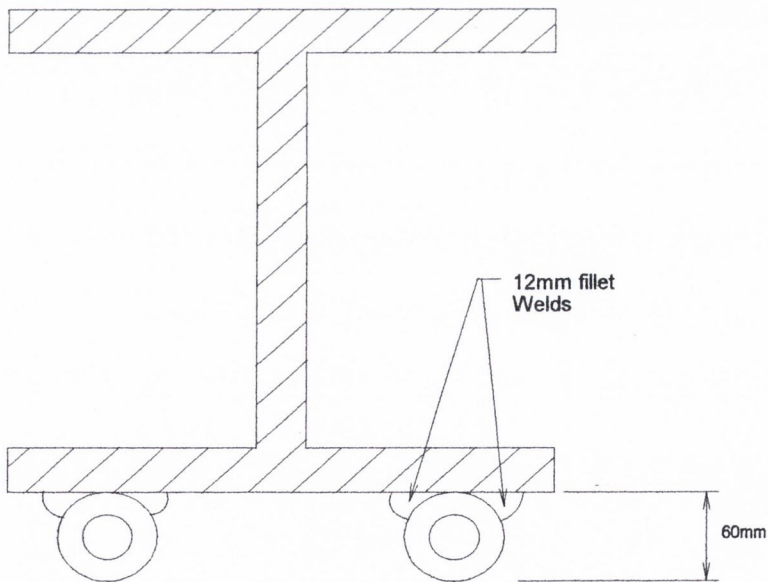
Cross-sectional view of the tendon thick-wall tubes welded to the underside of the lower flange.
